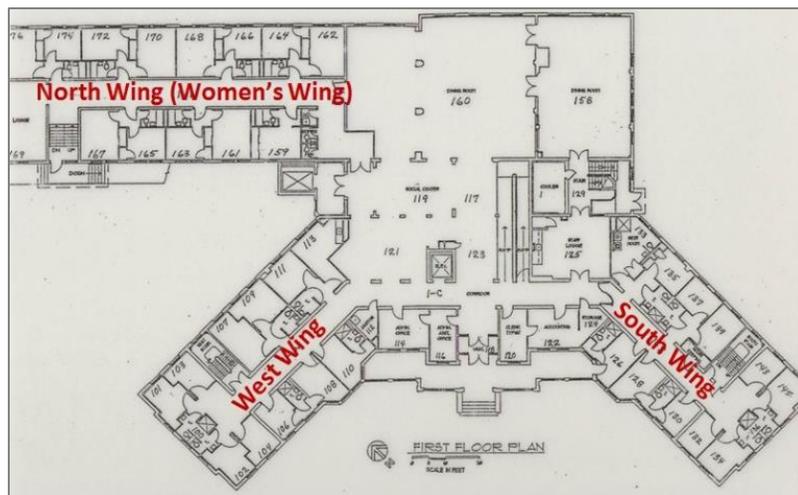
New wing designations. Source: Modified from current Pioneer's Home floor plans, on file at Sitka Pioneer's Home.
